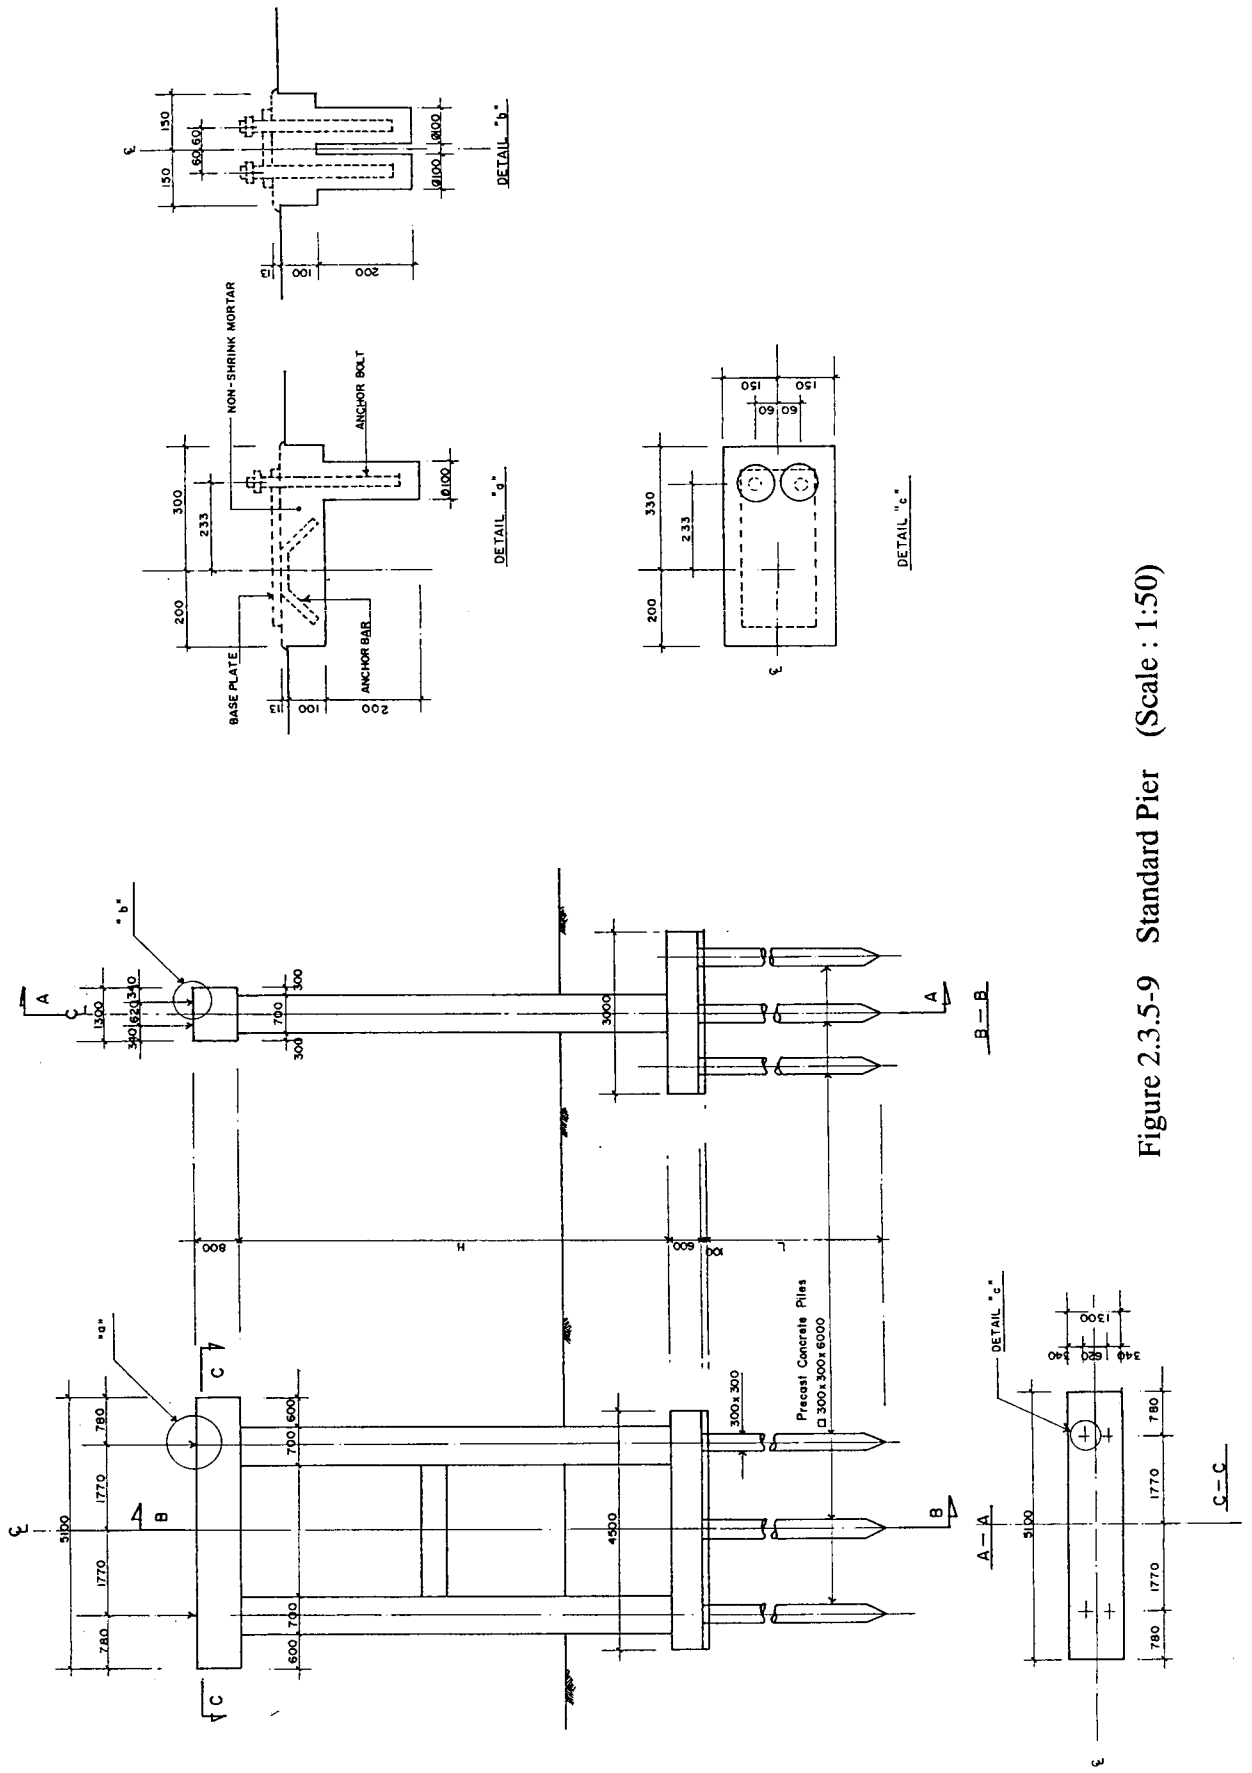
Standard Pier (Scale : 1:50)
